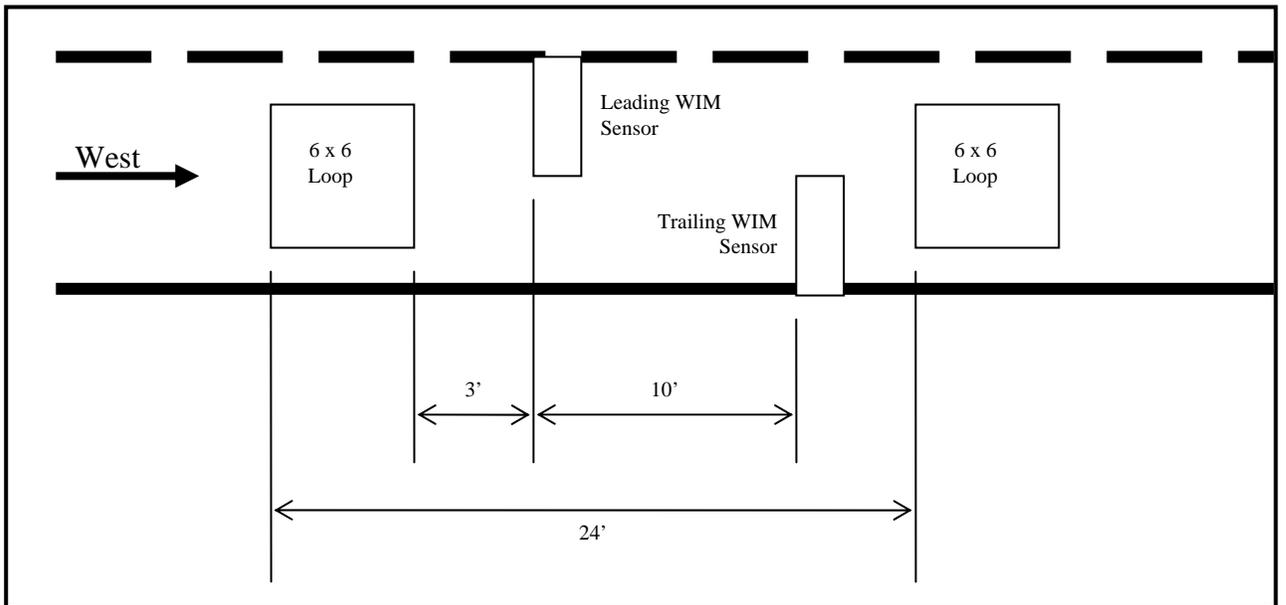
Equipment Layout of Site 200200 in Kansas
